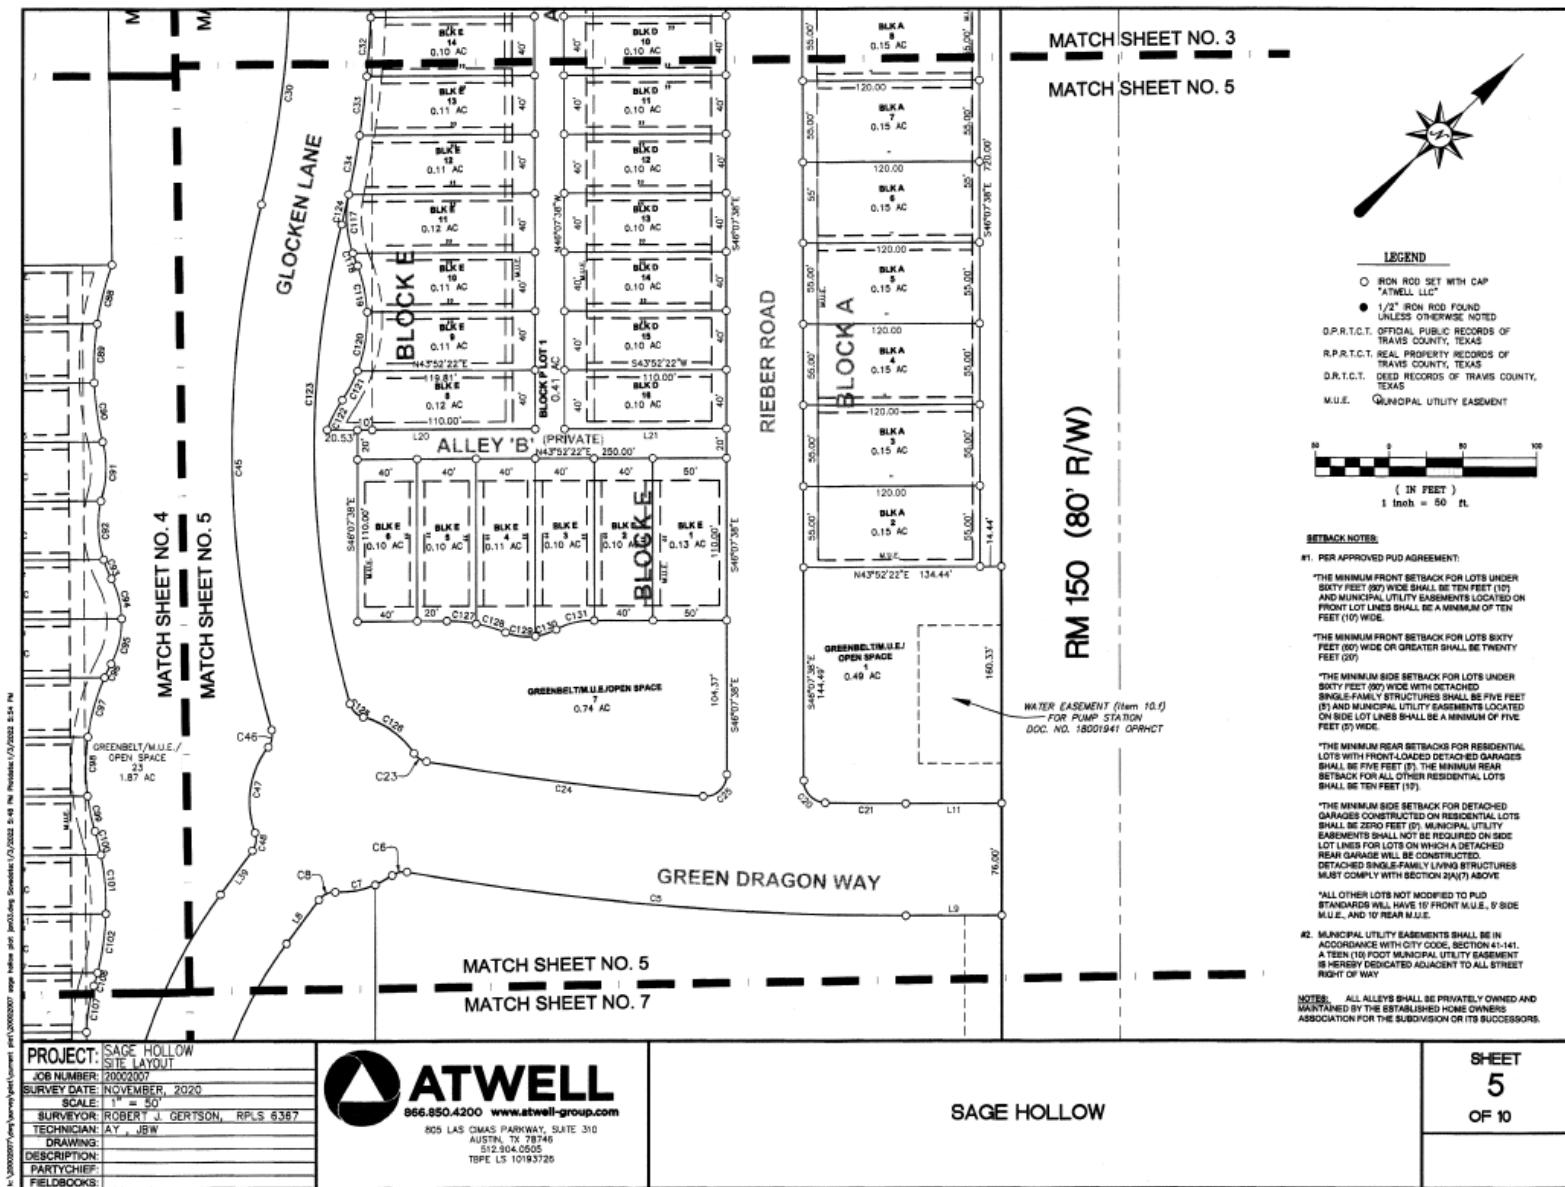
EXHIBIT K – SAGE HOLLOW FINAL PLAT
